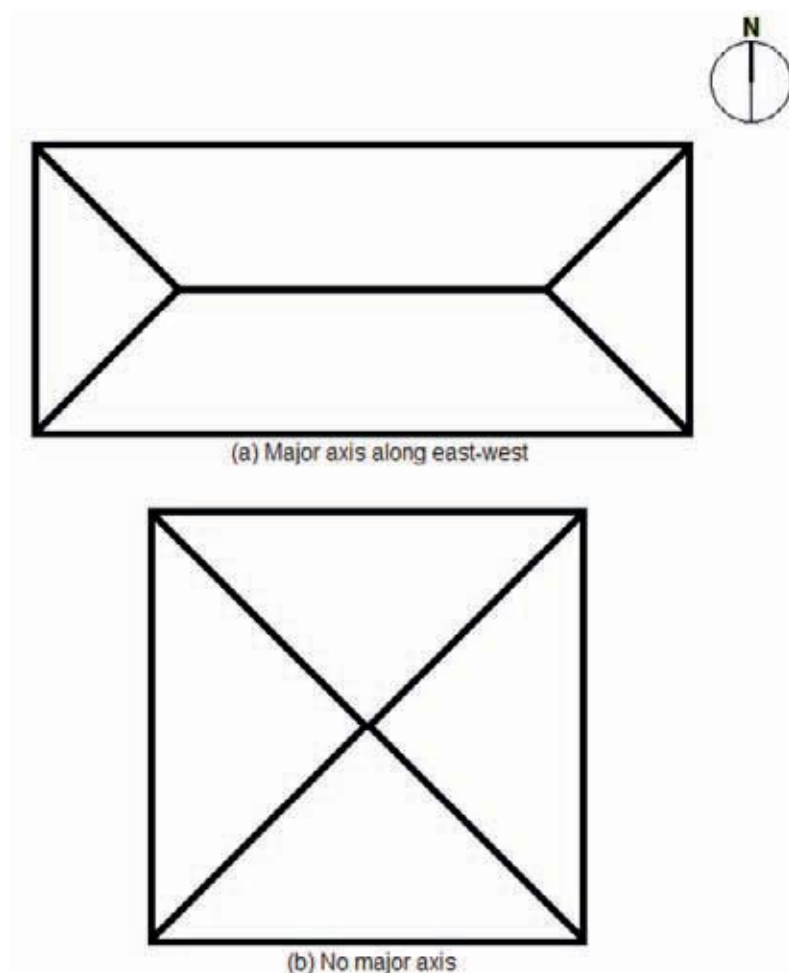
Building geometry (a) recommended geometry (b) site geometry may force a building plan to have no major/minor axis
